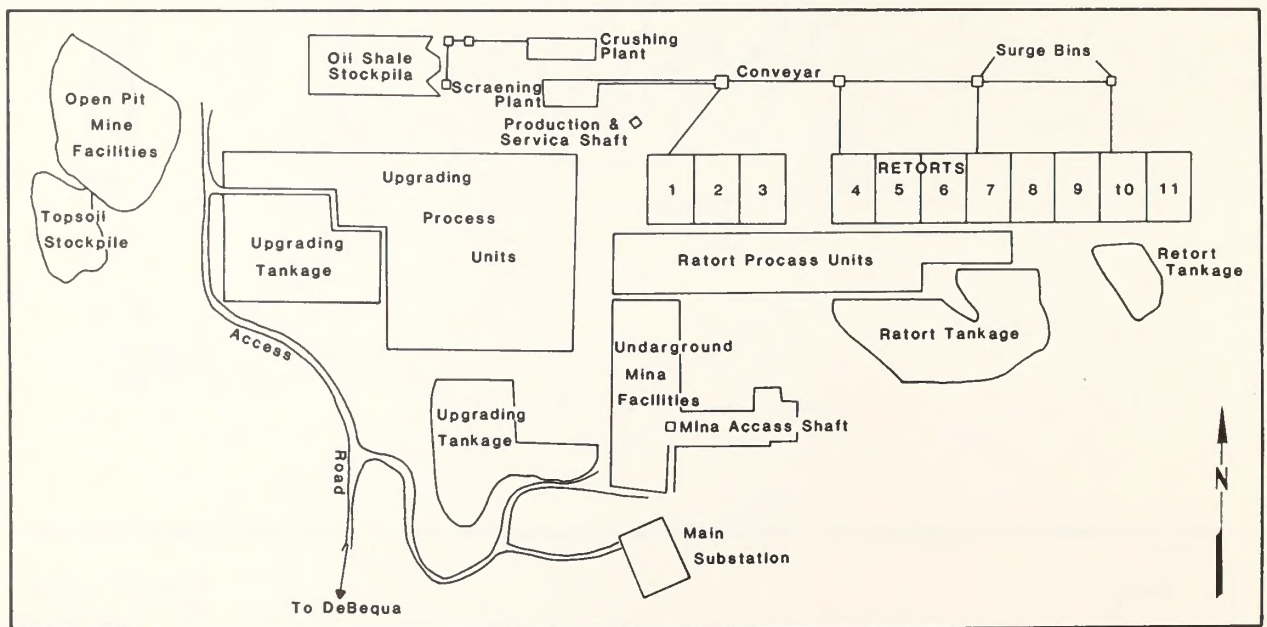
Plot Plan of Clear Creek Mesa Mine, Retort, and Upgrade Facilities
